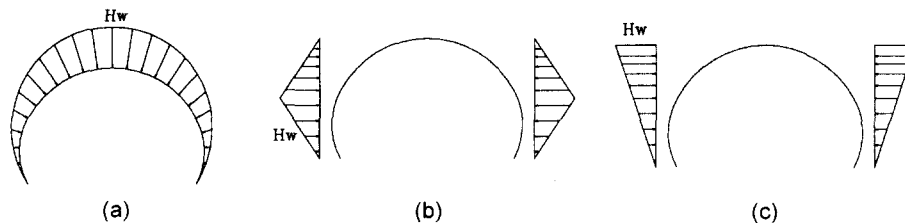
Water pressure model for drainage tunnel (Rock : $H_w = 1/3H$, Soil : $H_w = 1/2H$, H : Tunnel height).
